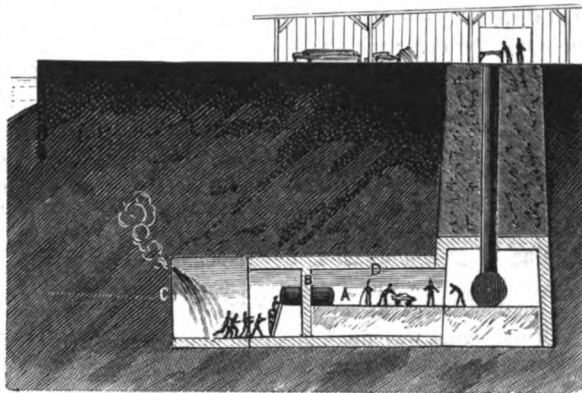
SECTION OF THE TUNNEL, CAISSON, ETC.
